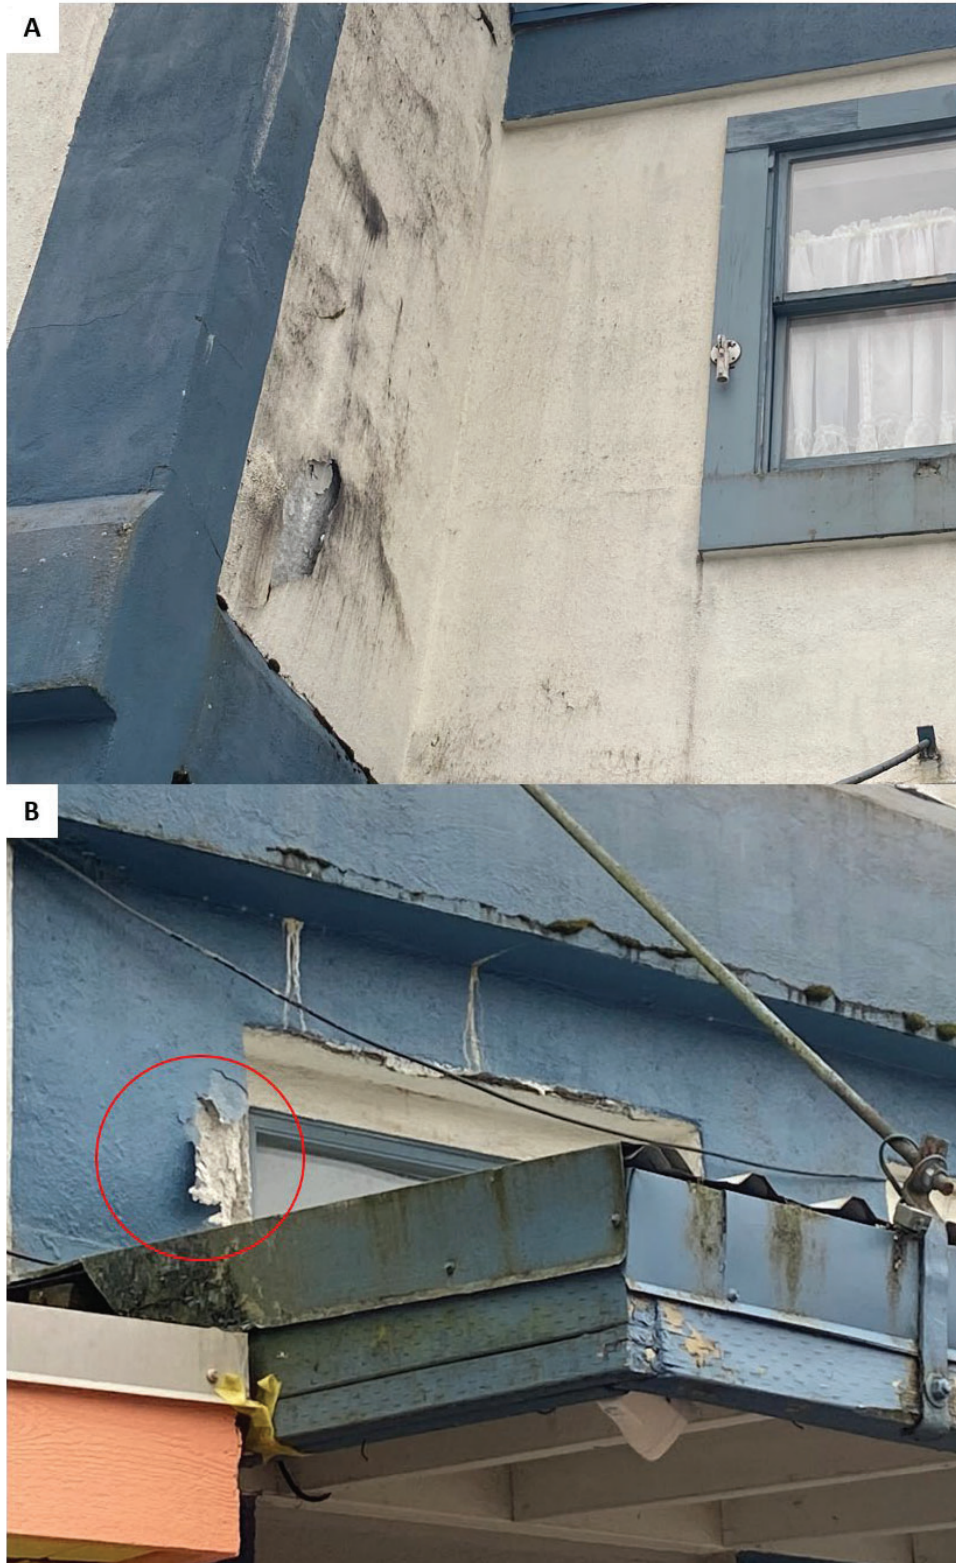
Filipino Community Building: (A) left side 2nd floor, showing separation of stucco from the main wall; (B) left side 1st floor, separation of external plaster (red circle) from the concrete wall/support.
